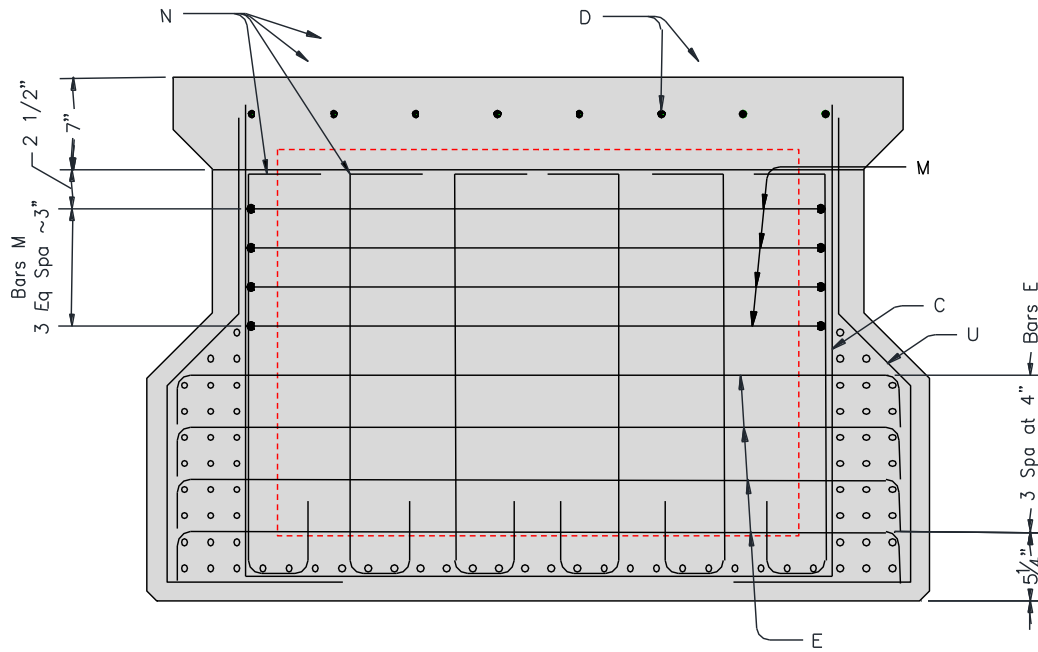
End region reinforcement used in 5B40-4. Second and Third steel curtain detail is shown.
